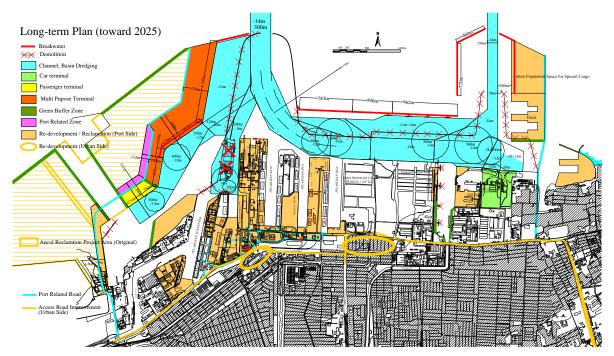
Long Term Plan of Tanjung Priok port toward 2025
